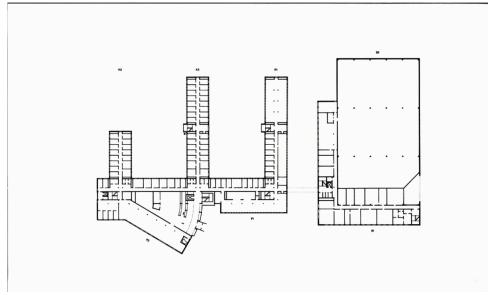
Floor plan of Prof. Olav Hanssens vei 10. (Thesen, n.d.-b)
